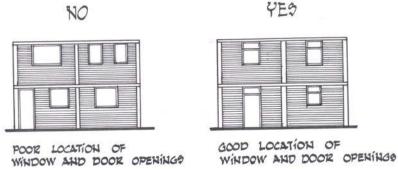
Opening arrangements on the wall surface (Brzev, 2007)
